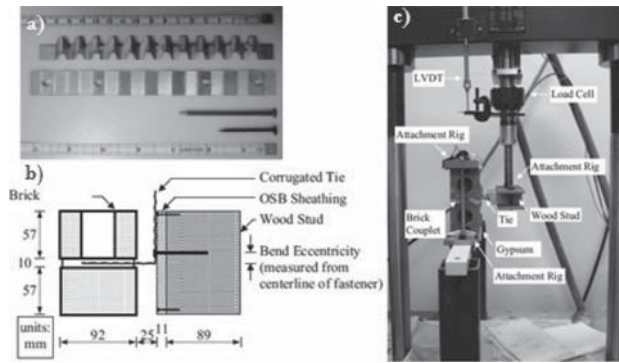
Details of tie connections under shear test: a) tie and fastener types, b) scheme of specimen and c) setup (Zisi and Bennett, 2011).
